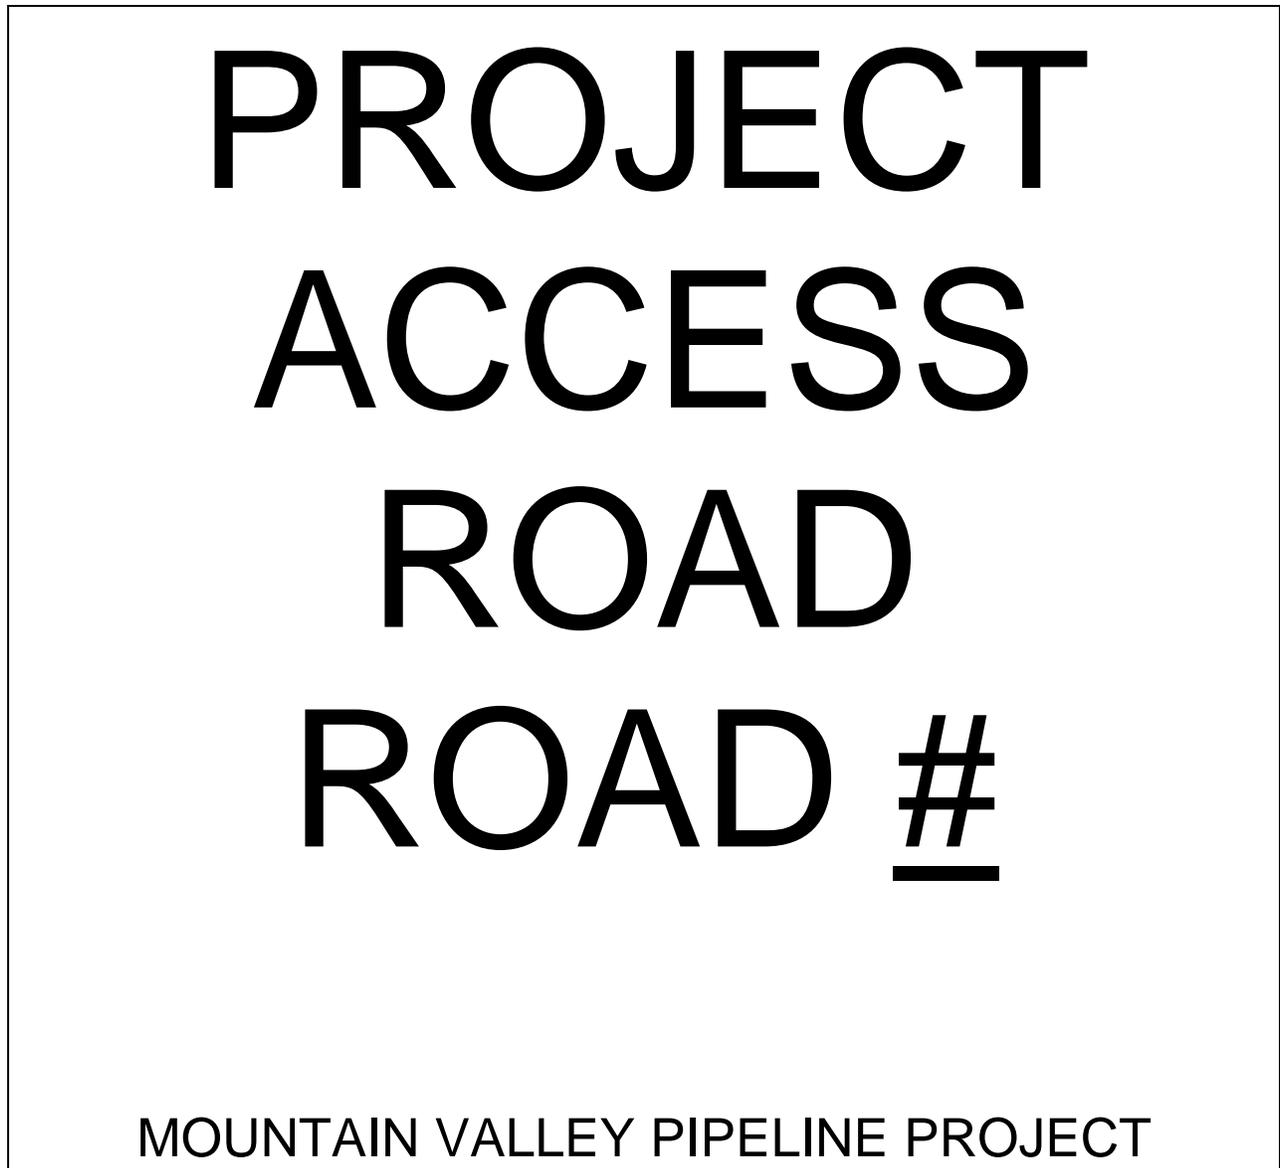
Typical Sign – PROJECT ACCESS ROAD
